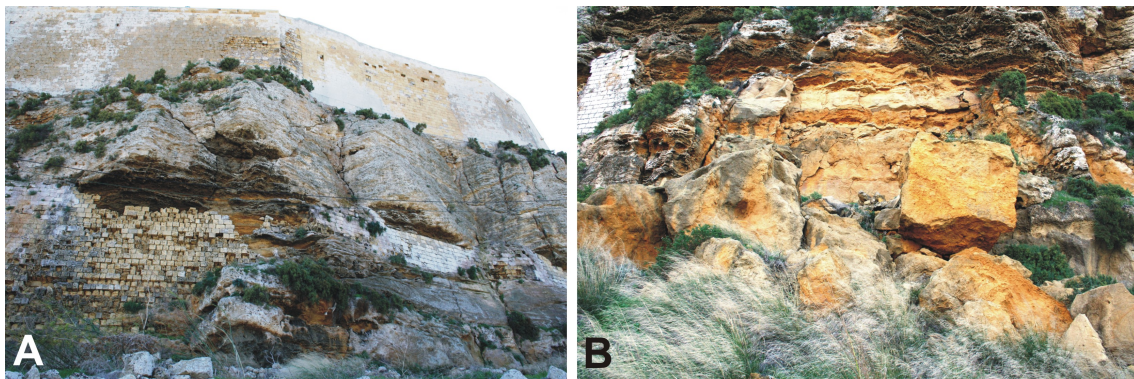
Instability mechanisms affecting the UCL rock plate underlying Citadel (A: rock mass and underpinning masonry; B: rock fall debris).
